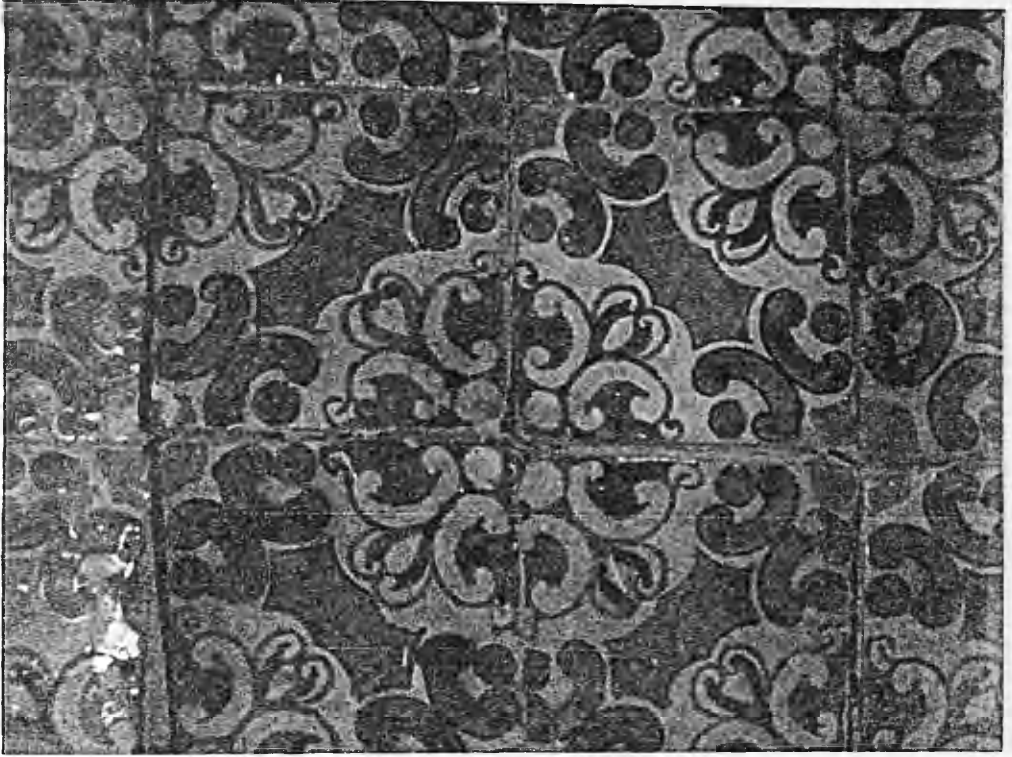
c - Prayer hall: tiles are loose and detached from the wall.
